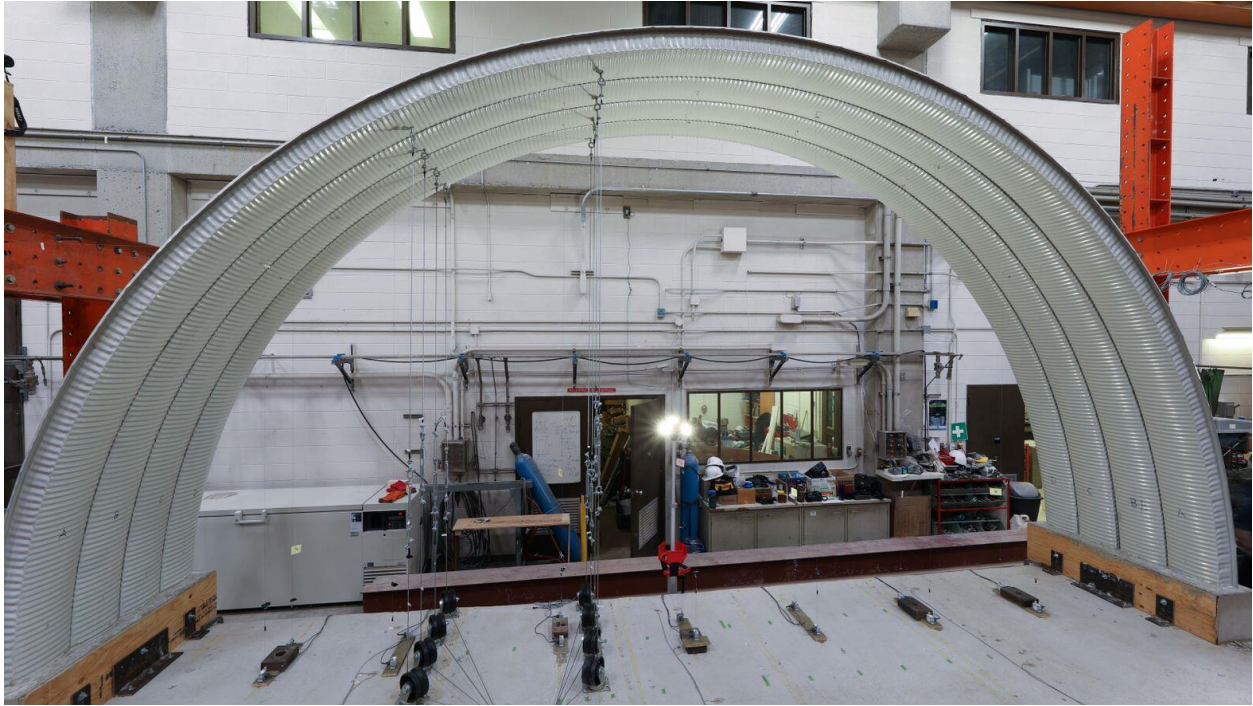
Unbalanced Loading & Fixed Support Specimen Prior to Loading
